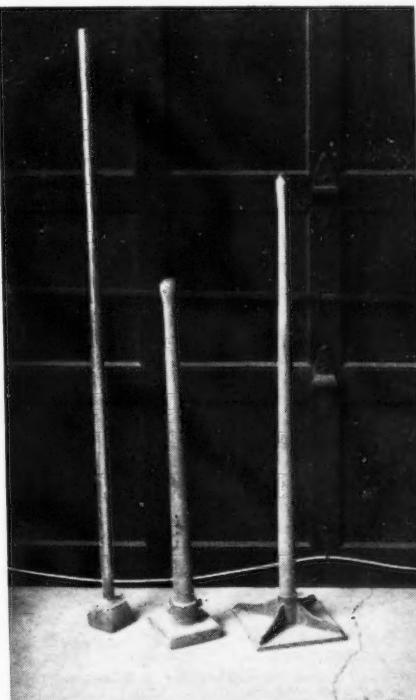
The only extra tools required for making the new type poultry house floors are one or two hand floor rammers. The shaft of the center rammer has been broken off and should be longer. This heavy 6 x 6-in rammer was used for making an entire floor, but a slightly better floor was built by using a combination of the other two—one small rammer and one 10 x 10-in light rammer. The small rammer was made at a welding shop; the other two were bought from the local hardware dealer
